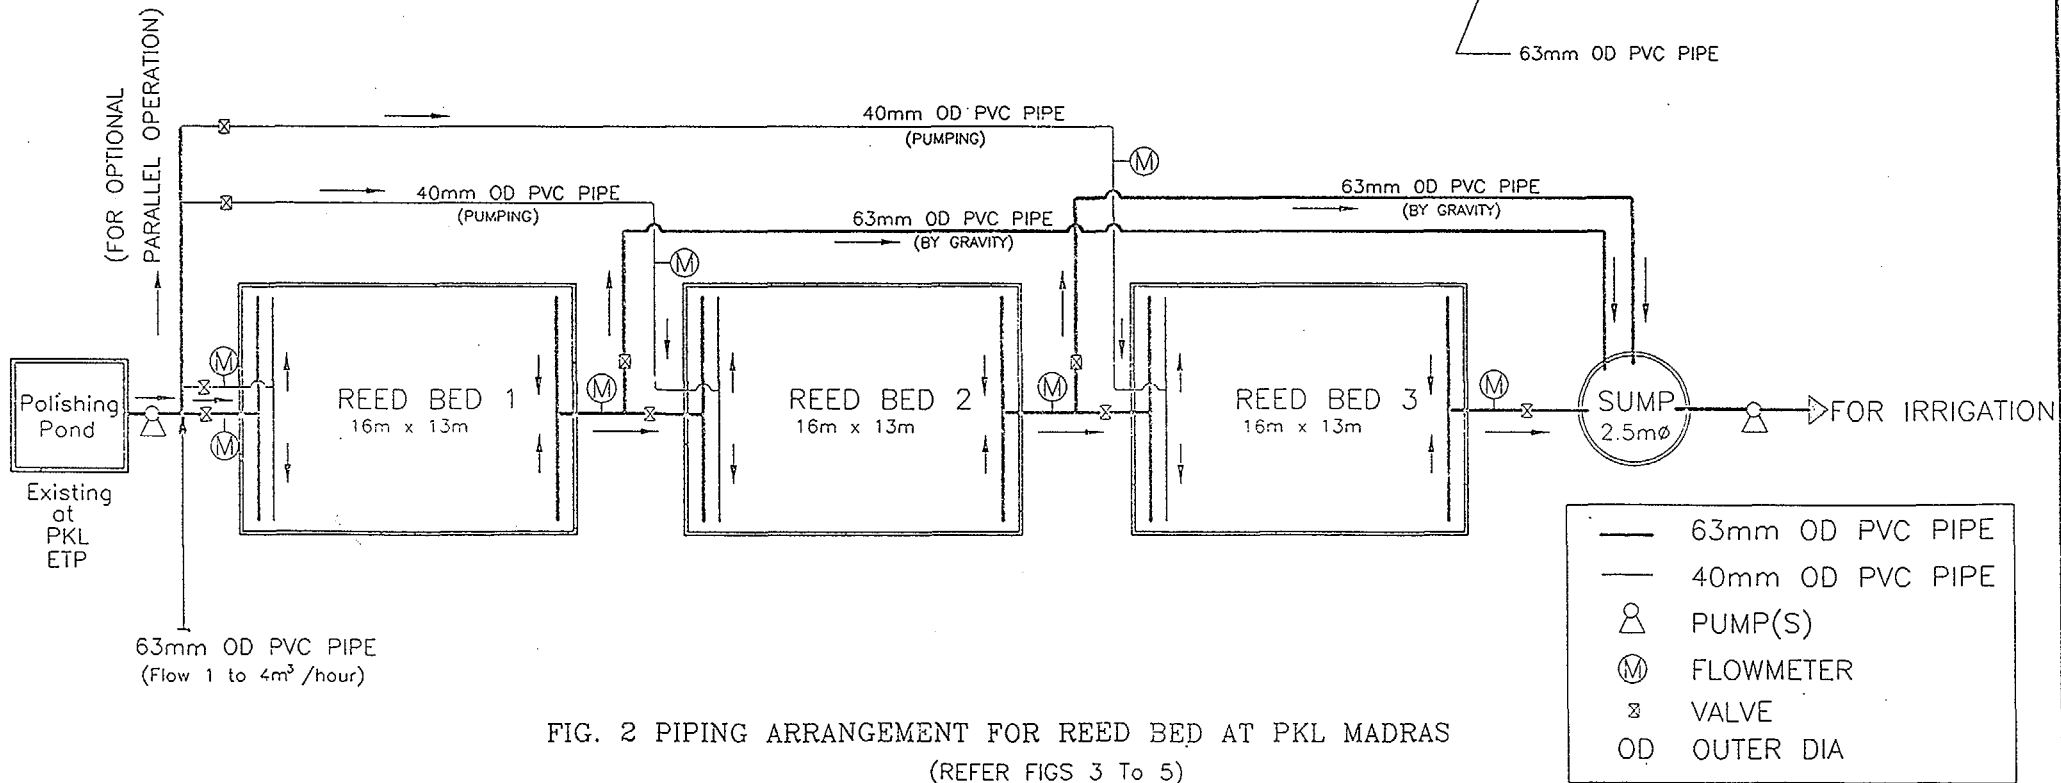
PIPING ARRANGEMENT FOR REED BED AT PKL MADRAS
